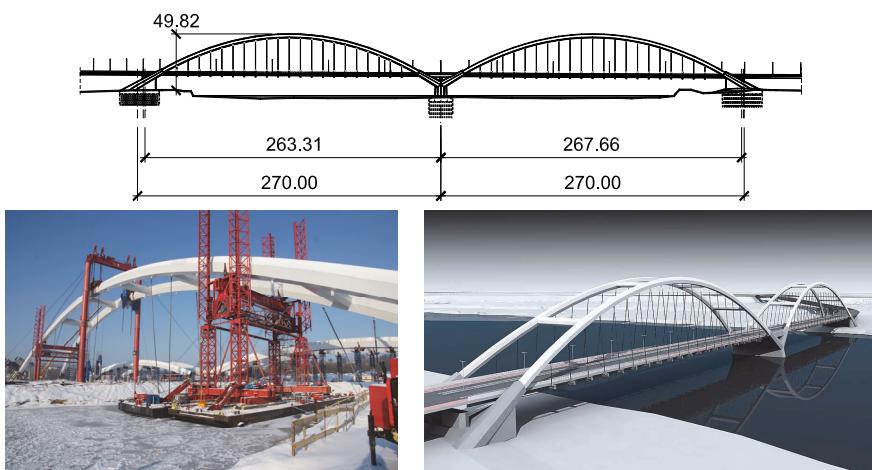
Side view, assembly of the arches (photo: K. Jędrzejewski – Strabag) and computer image of the bridge in Toruń [7]
